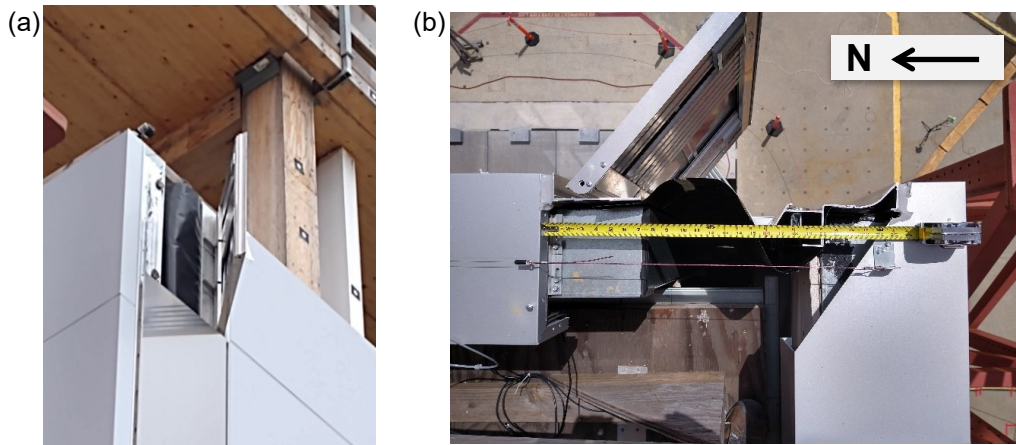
Corner expansion joint corner after opening viewed from (a) outside and (b) above
